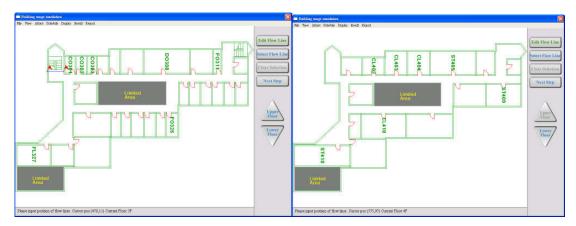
Plan B—(a) 3F space layout, (b) 4F space layout.
